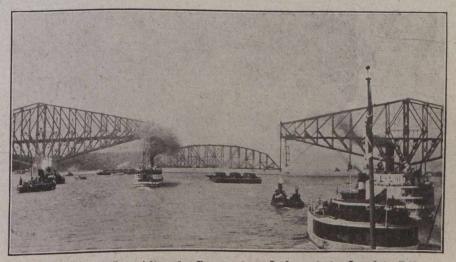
Taken Just After the Barges had Left and the Load is Being Carried by Cantilever Arms. Note One of the Specially Built Barges Floating Down Stream.
